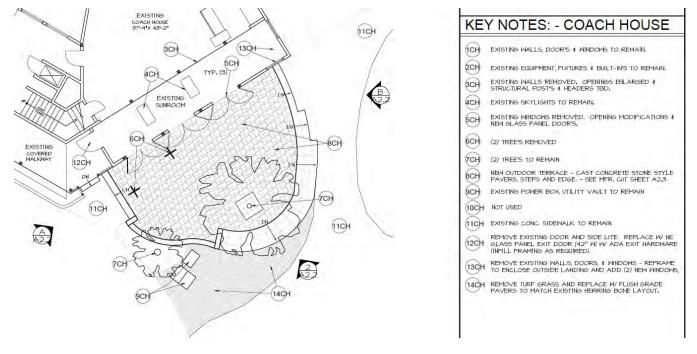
Proposed New Terrace, Excerpt from Page 5 of Exhibit A-6
